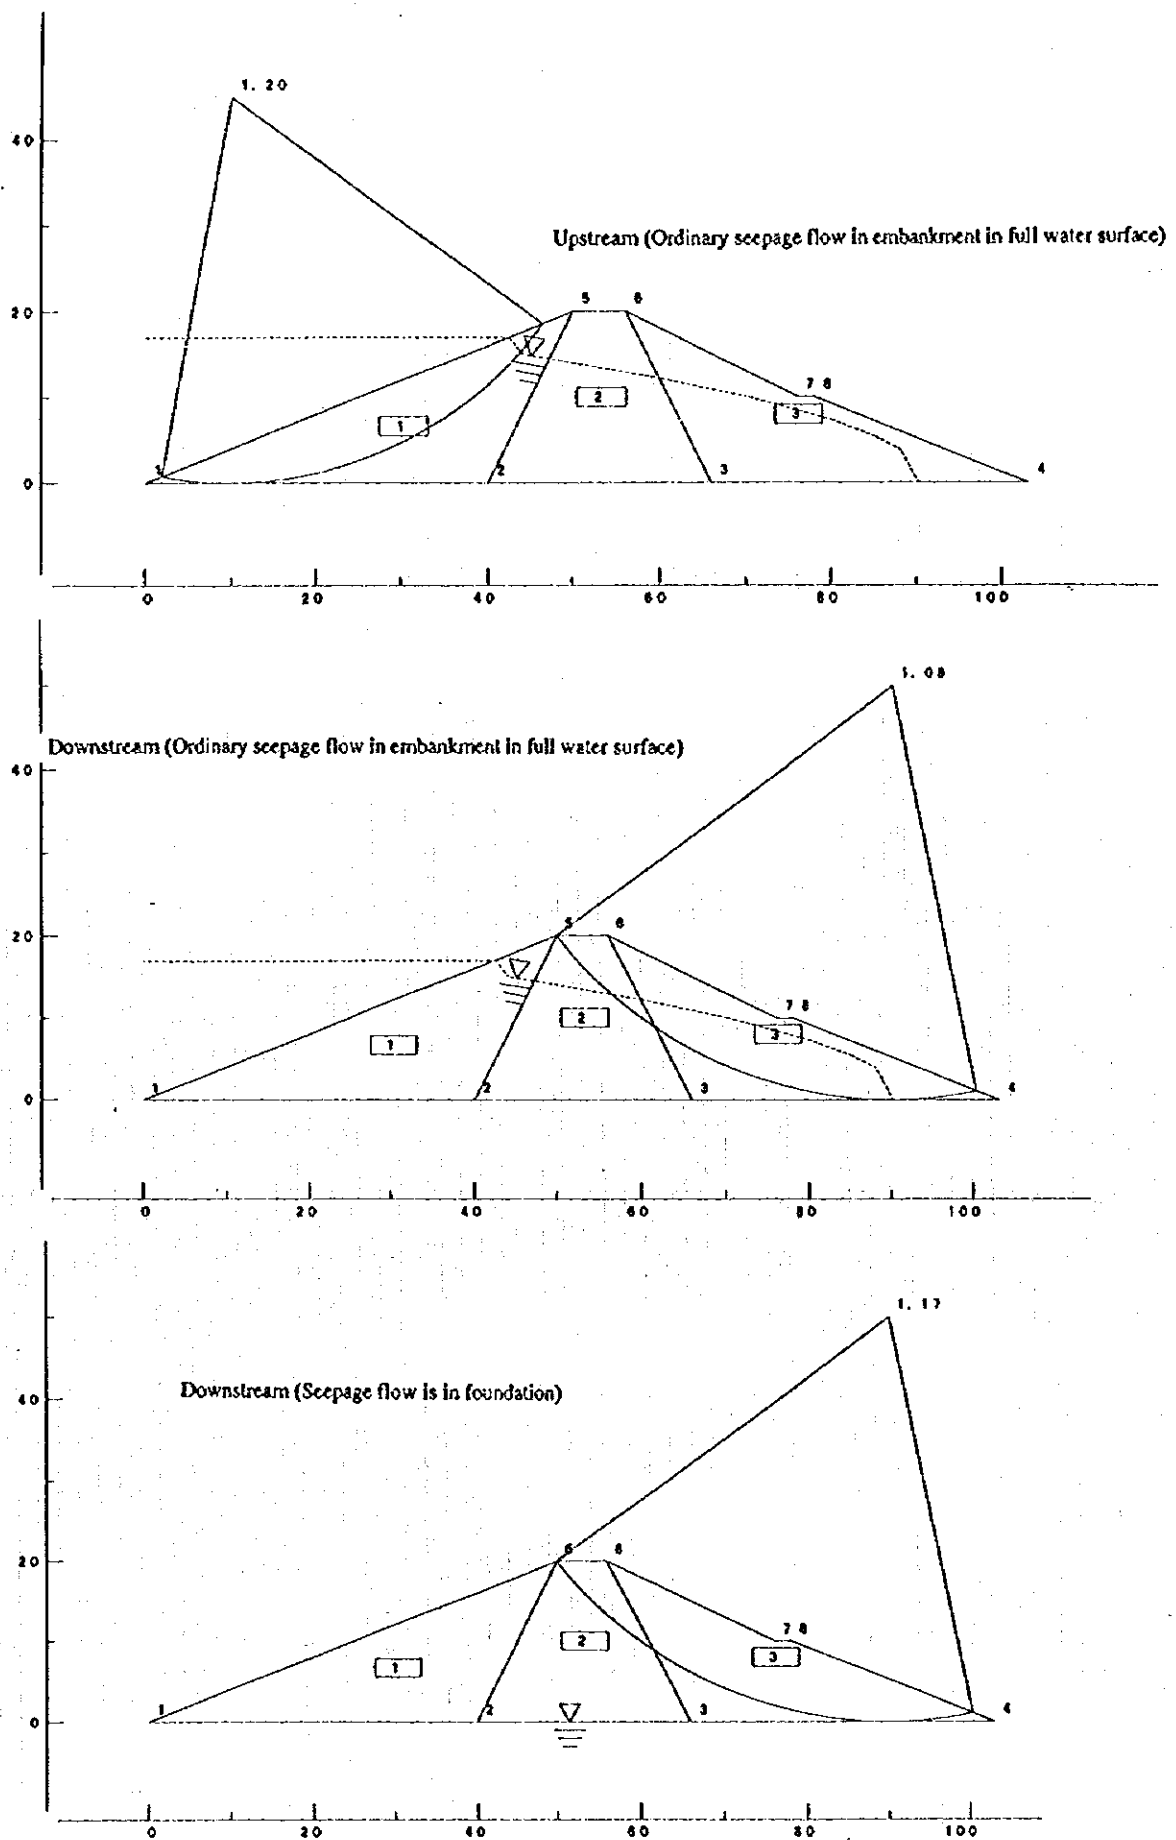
Sliding Calculation of 20 m Height Dam
